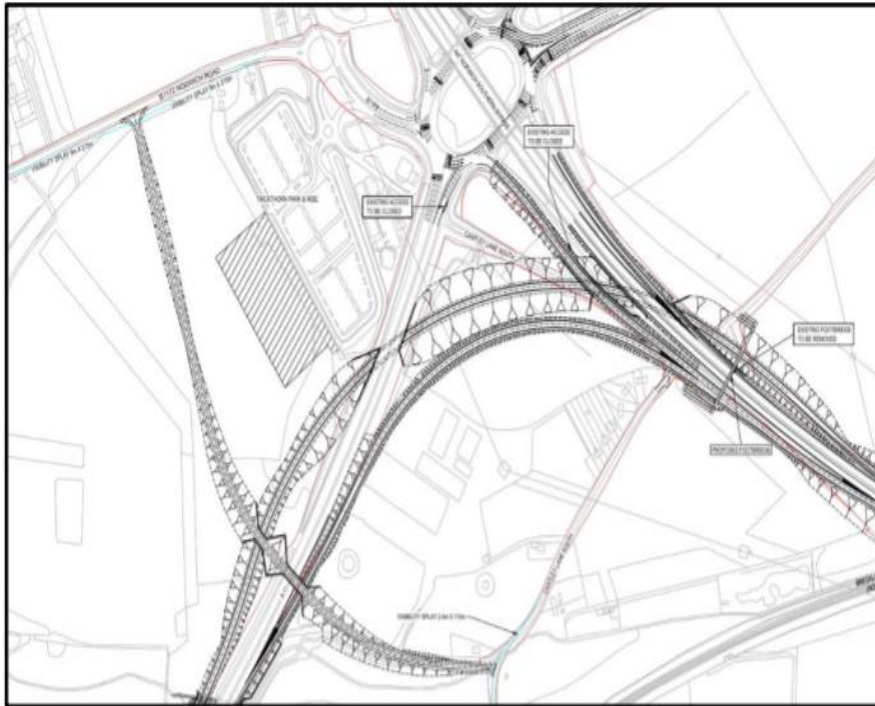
Option 4: Connection of Cantley Lane South to B1172 Norwich Road
